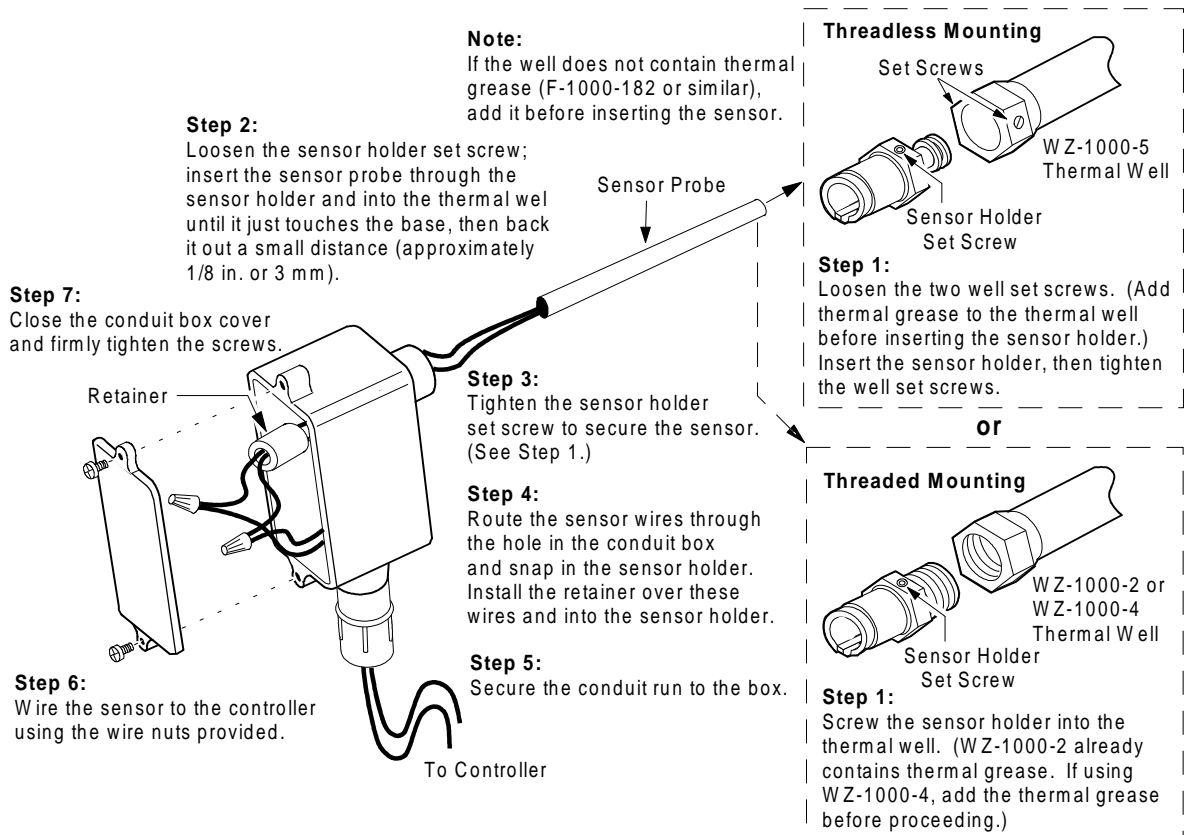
Installing the Well Sensor using the Sensor Holder and Retainer
